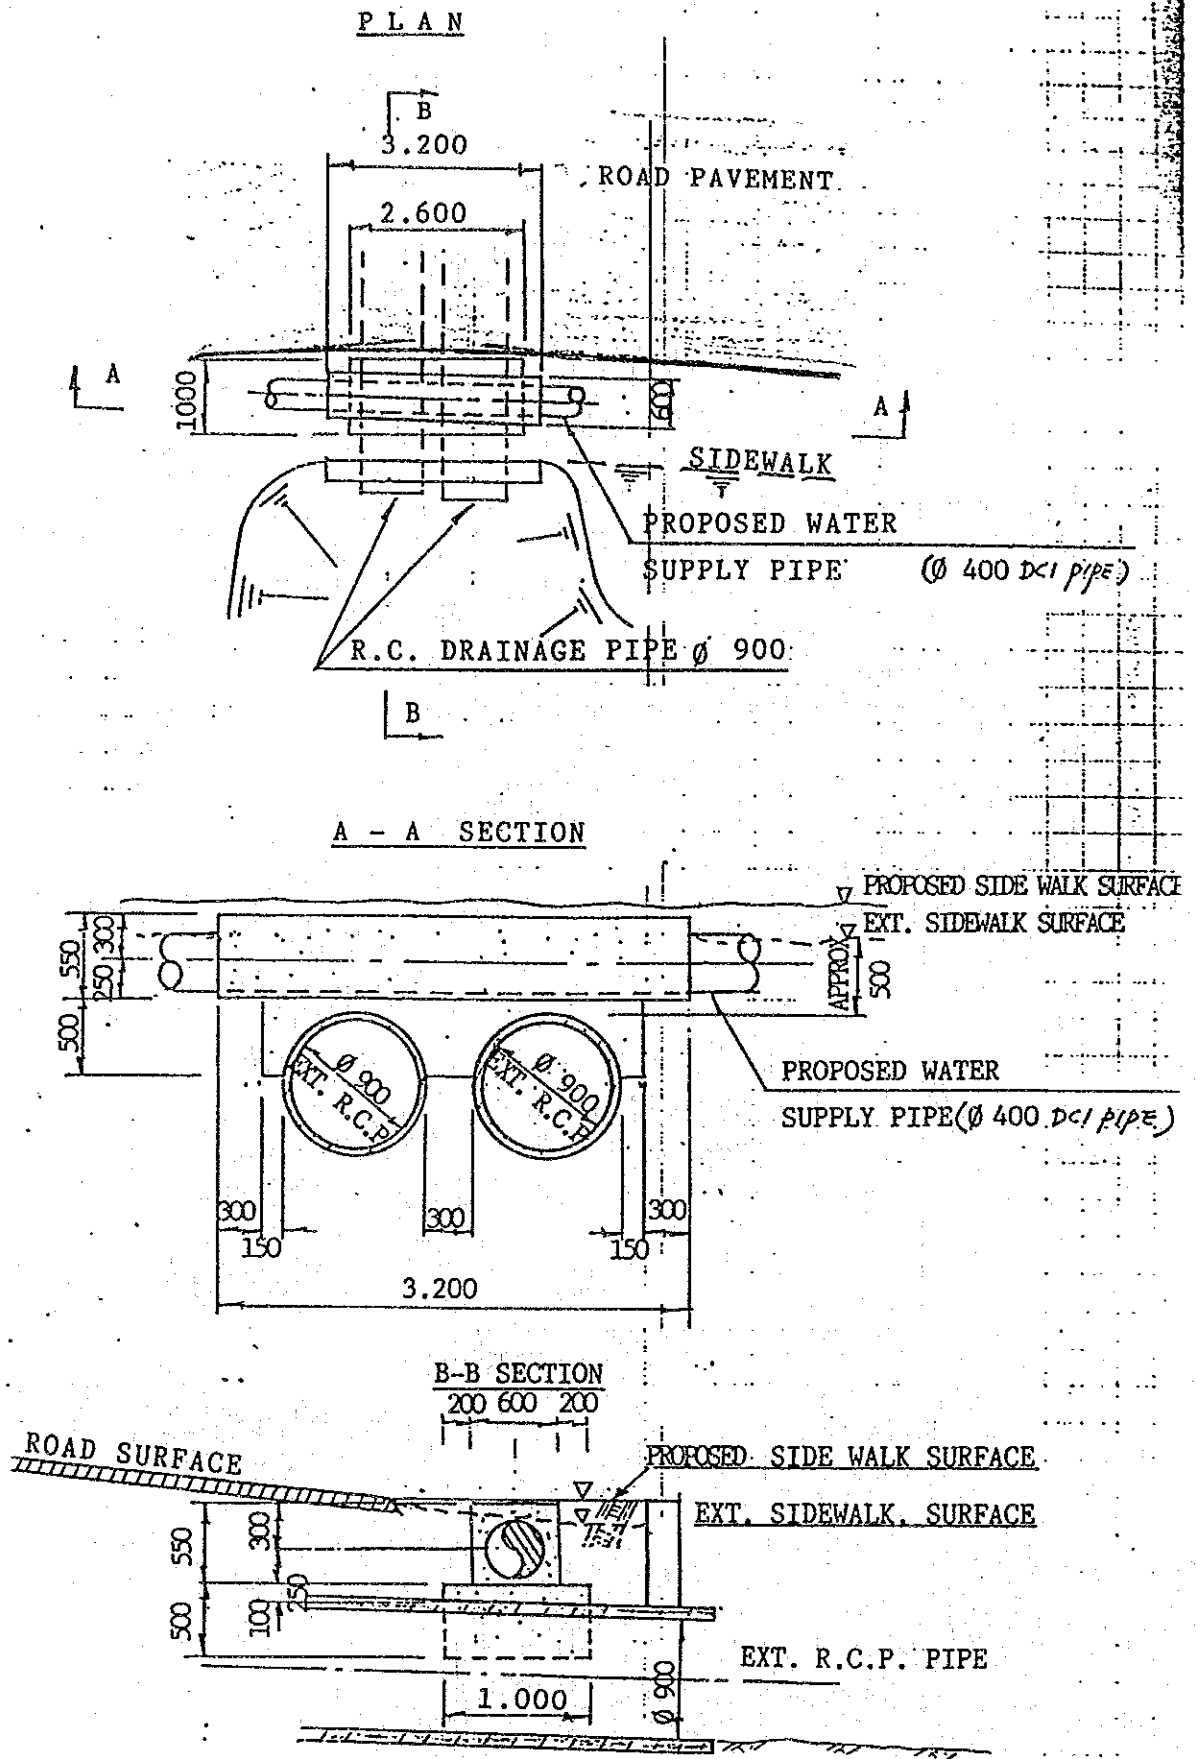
DETAIL OF WATER PIPE LINE BESIDE EXIST. CULVERT
